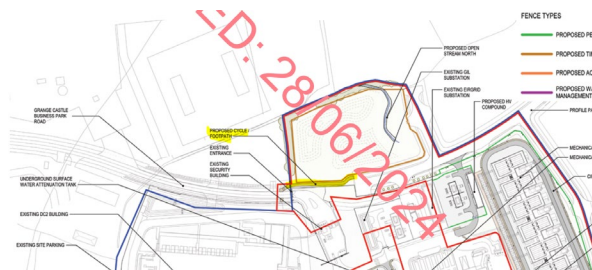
Proposed cycle and footpath joining Profile Park Road and Grange Castle Business Park Road
